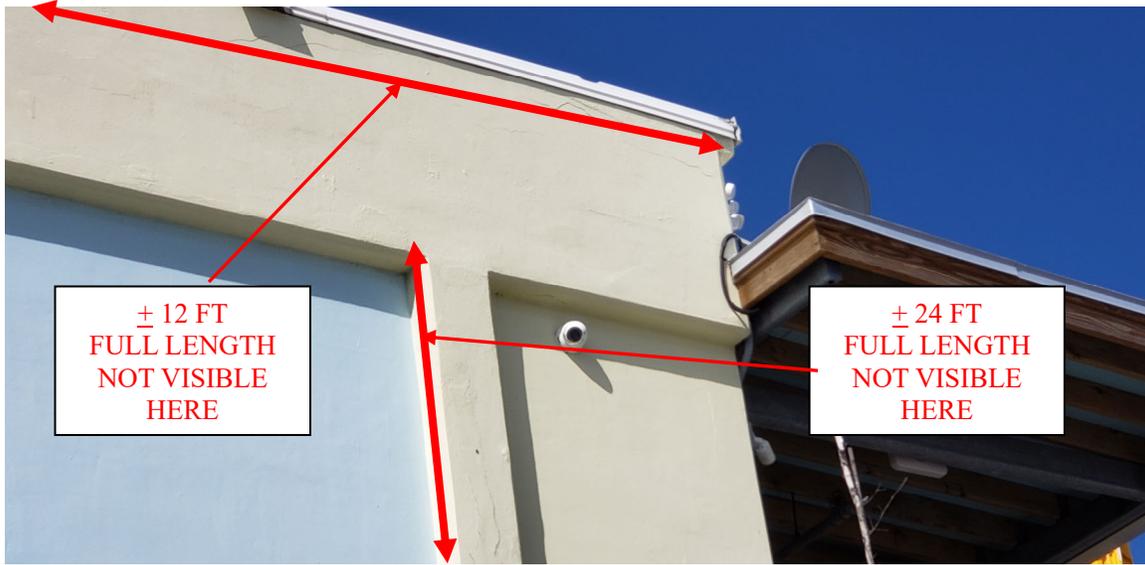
Location 17: Approximately 24 ft long new 12x12 concrete column. See detail 2/S102. Approximately 35 ft long bond beam. See detail 9/S104.
